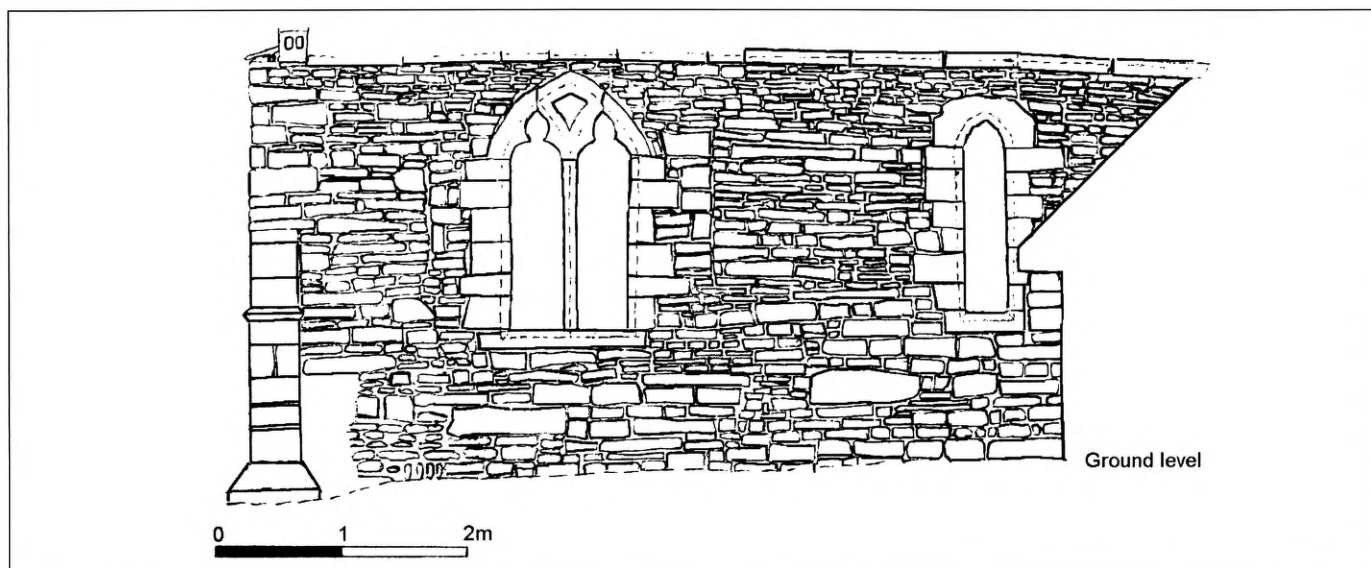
A North aisle wall, external; large stones of a possible earlier structure in the west end of the north aisle wall
